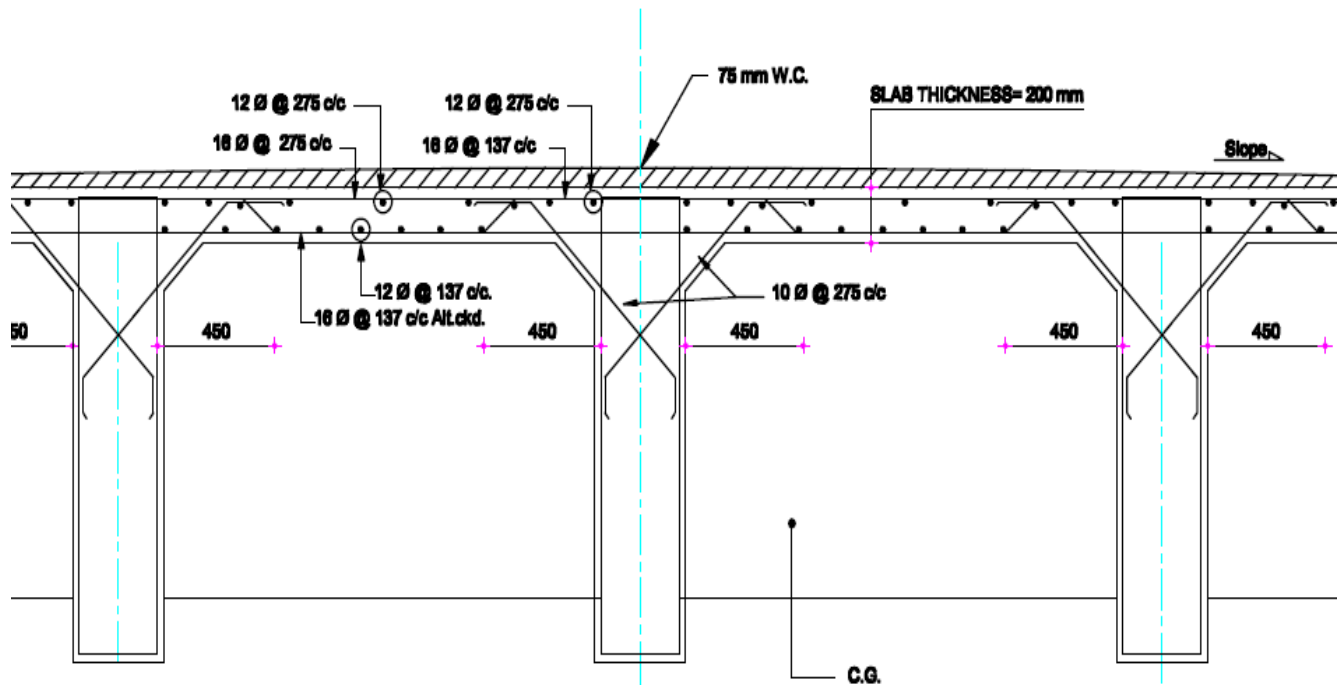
Typical deck Slab Detailing of 21m Span (Drawing from Roads & Highway Department)
